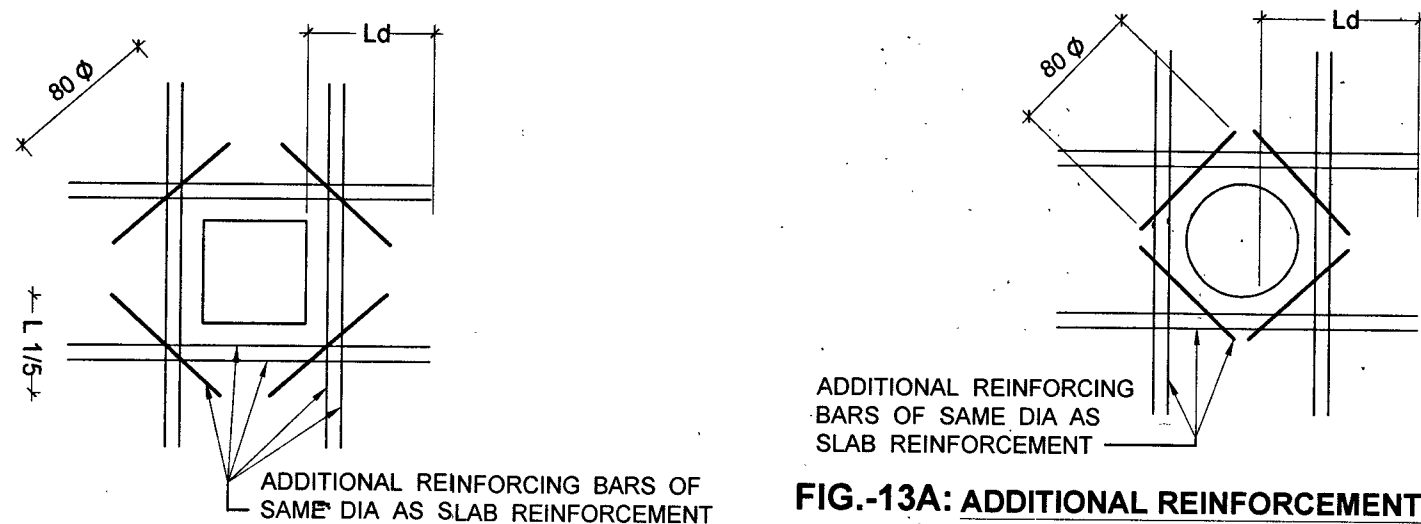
ADDITIONAL REINFORCEMENT AROUND A RECTANGULAR OPENING IN A SLAB
